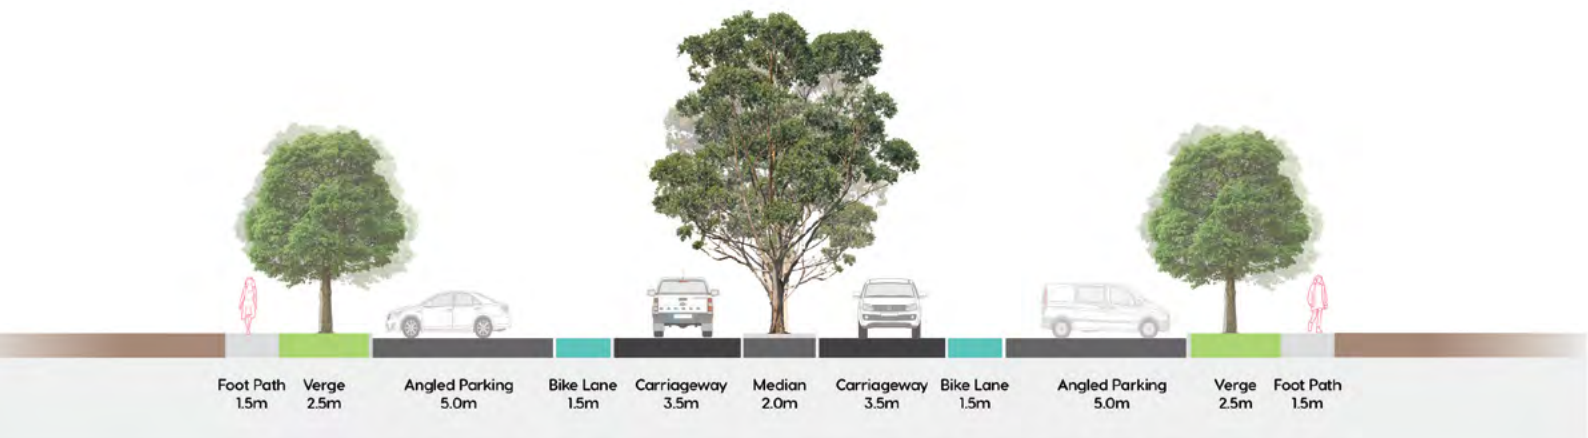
Proposed upgrades in O'Callaghans Parade - Typical Section
